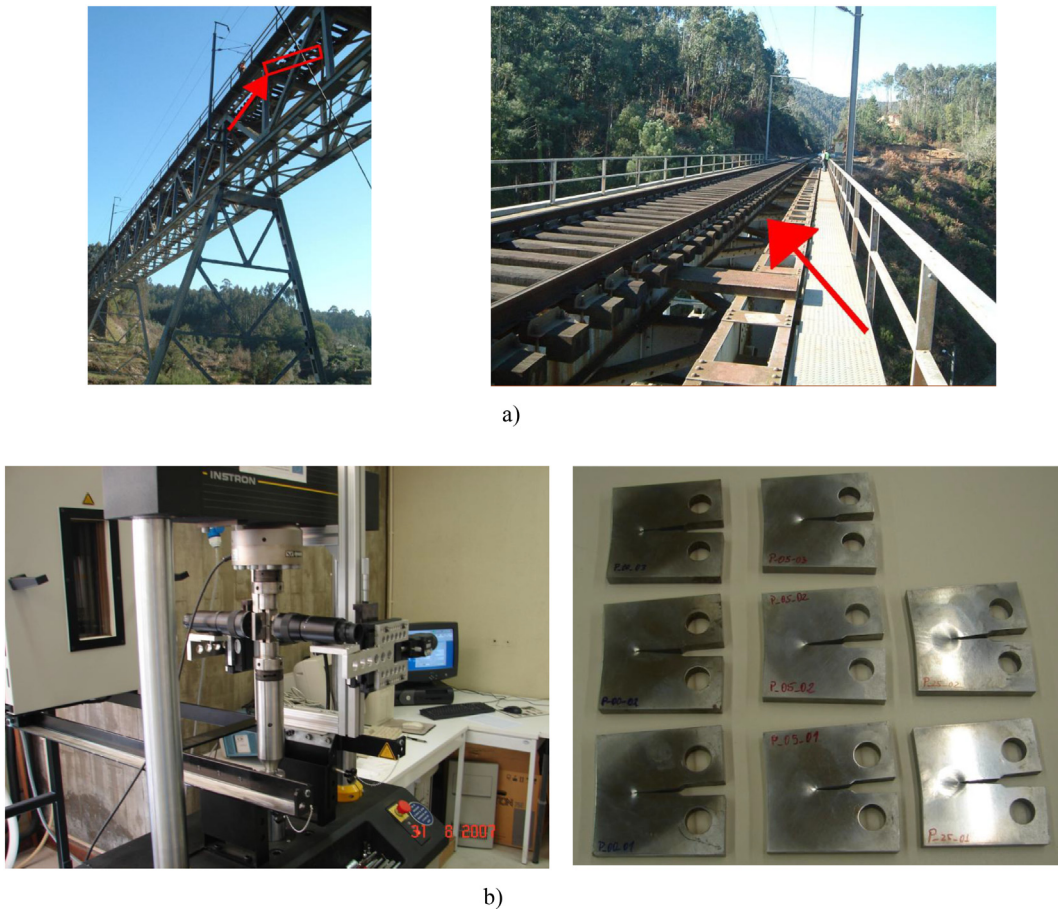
Fatigue crack propagation tests: a) location of the original bracing removed from the bridge; b) optical system for crack growth measurements and CT specimens after testing [14].
